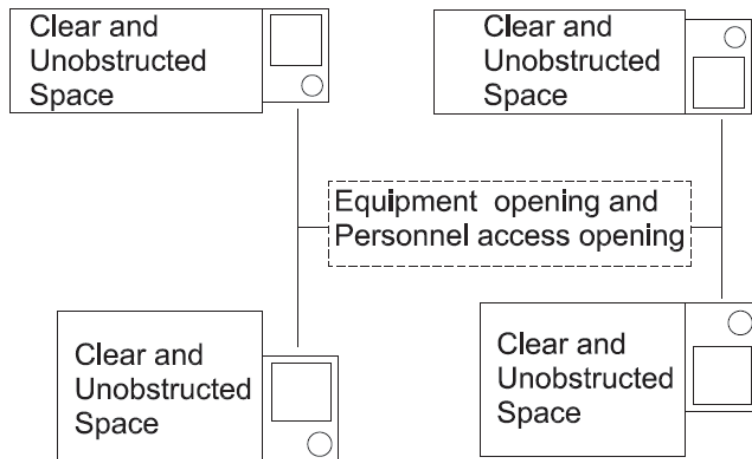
Typical arrangement of vault room in relation to equipment and personnel access opening.
